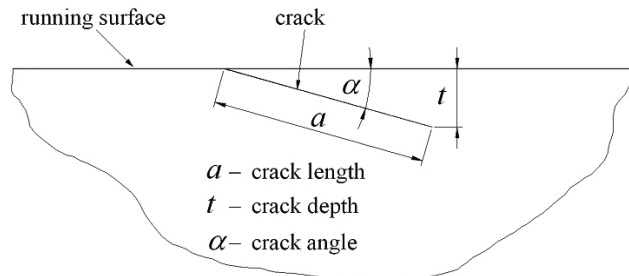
Fracture mechanical model, definition of length, depth and angle of the RCF cracks
